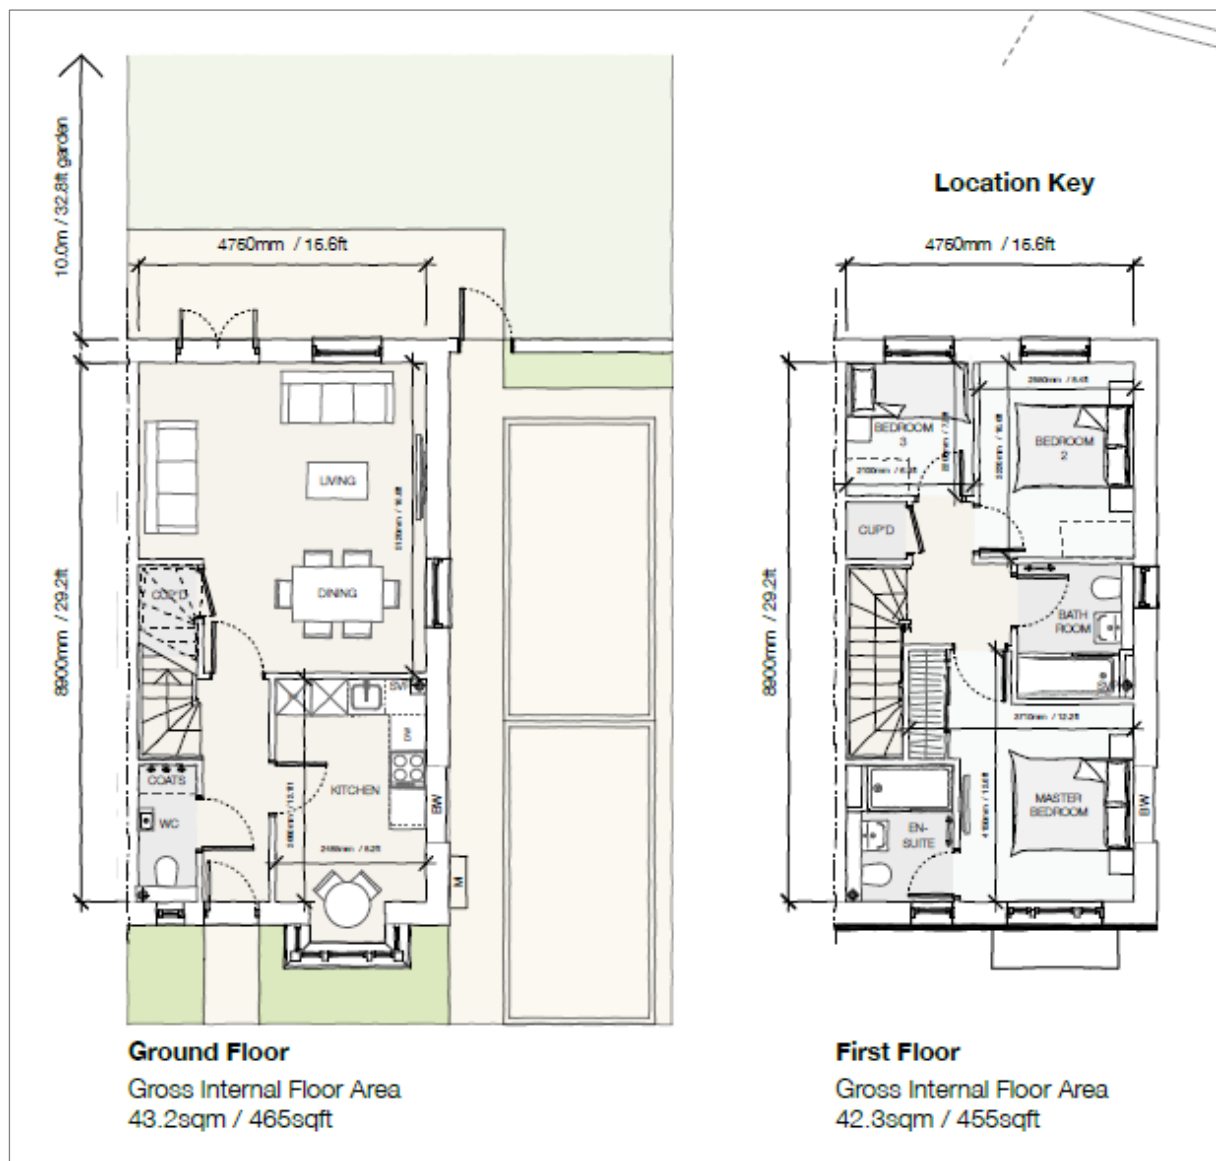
House type, 3bed dwelling used for the assessment – Floor Plans.
